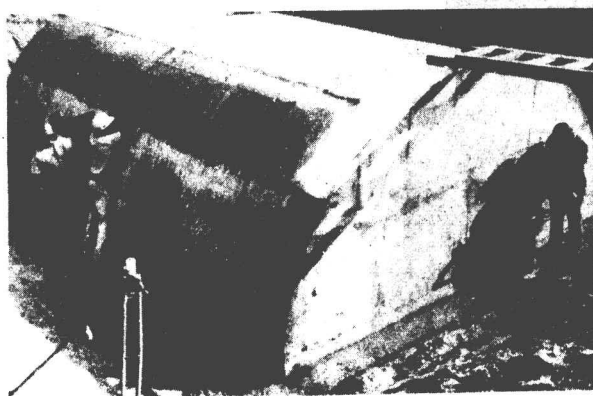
Scale model reinforced concrete arch for underground command and control center
